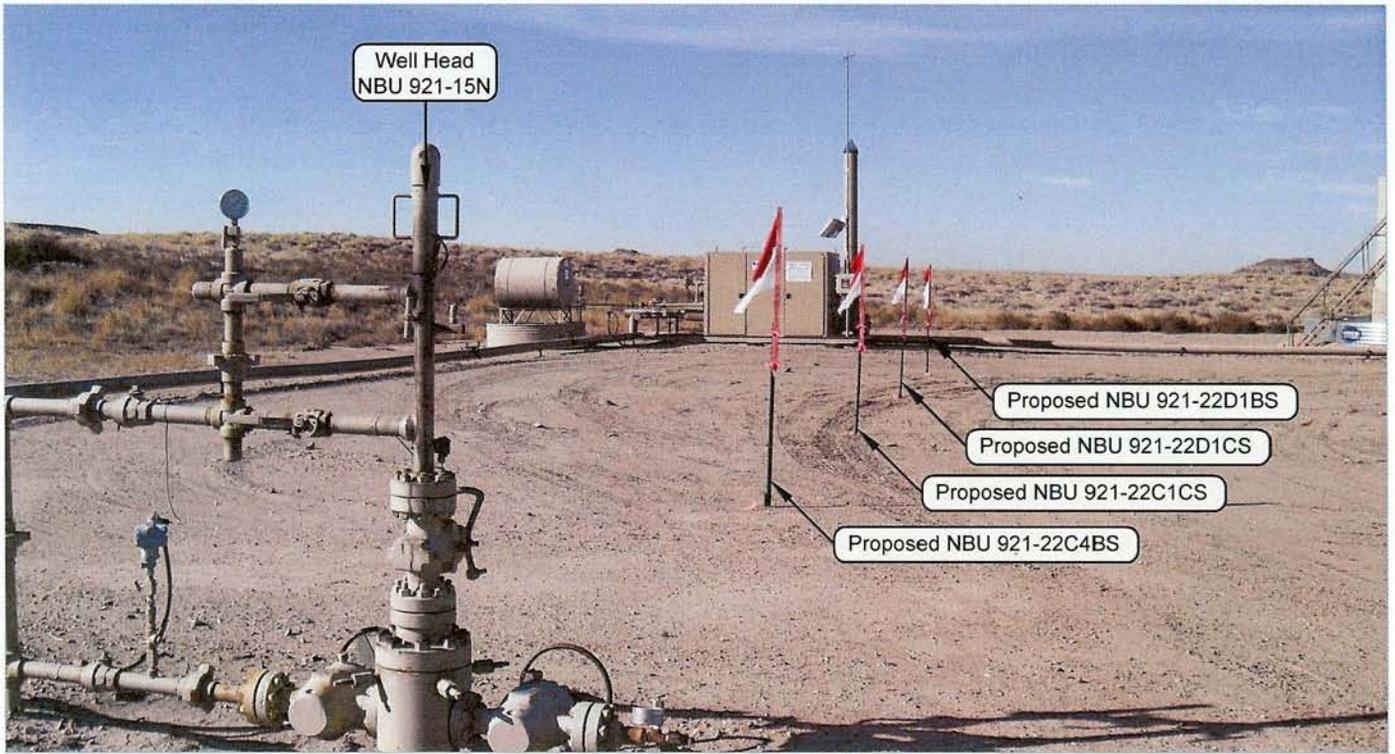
PHOTO VIEW: FROM EXISTING WELL HEAD TO LOCATION STAKES CAMERA ANGLE: SOUTHWESTERLY
